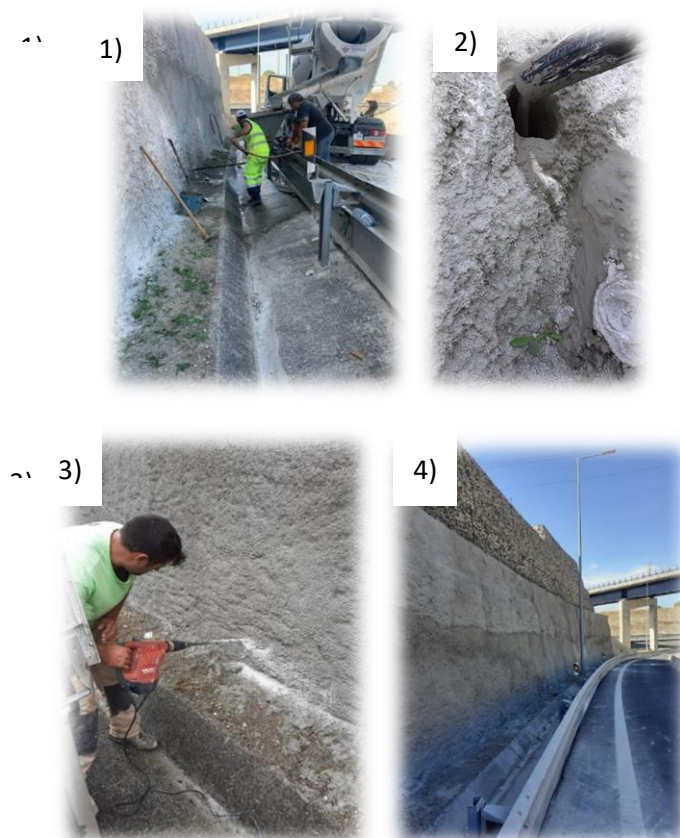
Construction Phase: Photos: 1) projection of 5 cm of reinforced concrete; 2) Gravity Injection of the cement, 3) Drilling for installation the geodrains and 4) Final view after the reinforcement of the gabion wall.
